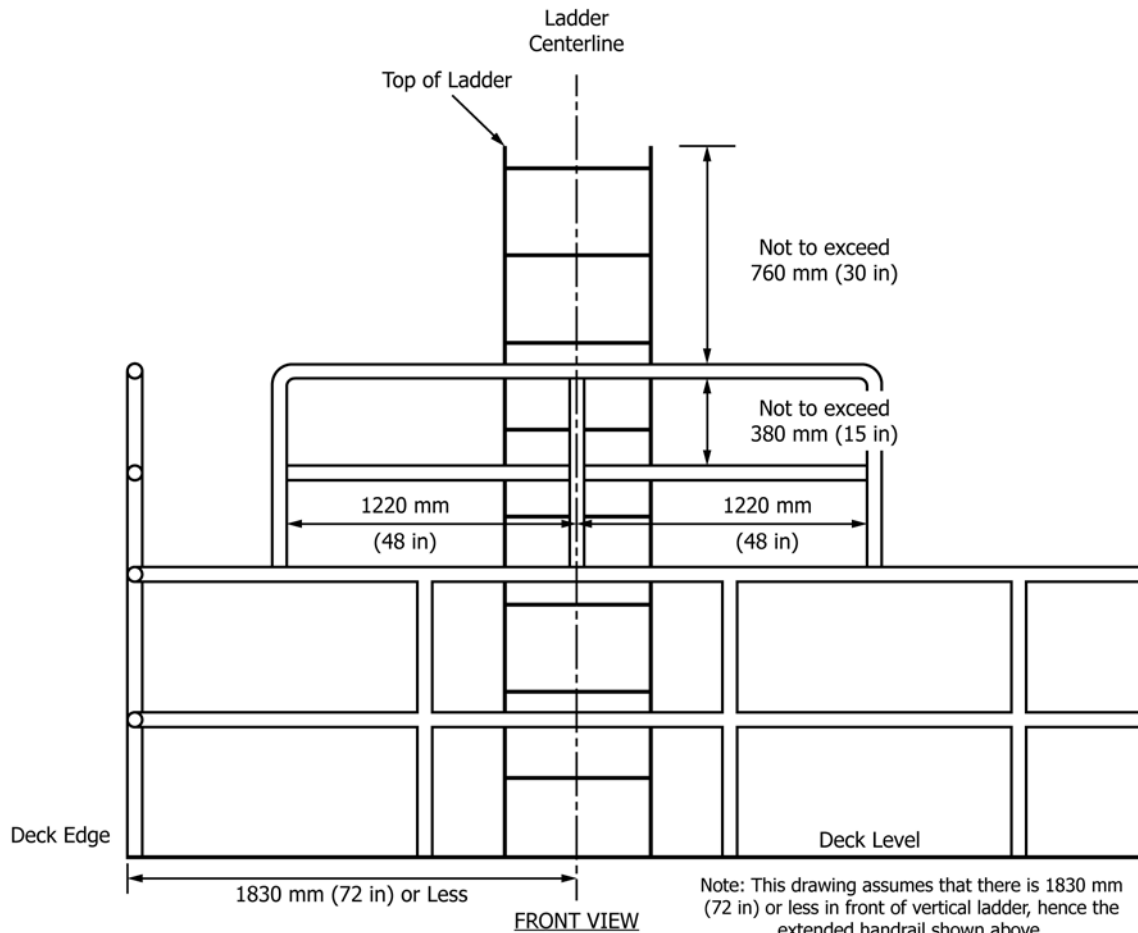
Extended Railing for Ladder Fall Protection (Front View)
